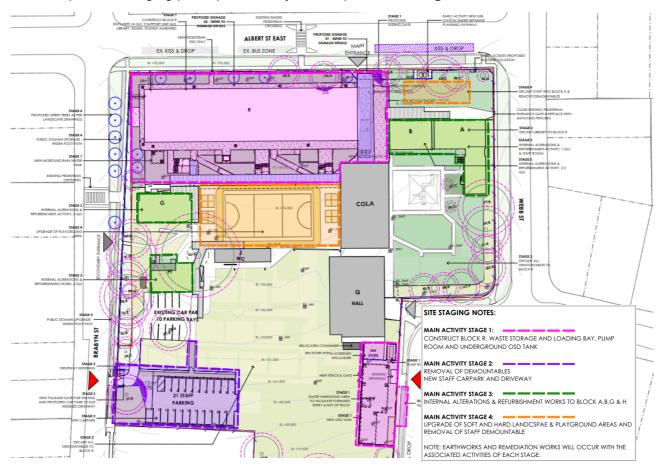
Excerpt of proposed Staging Plan Source: JDH
